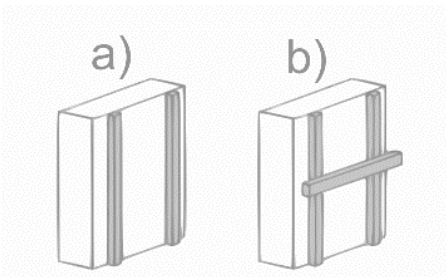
Substructure as a) vertical or b) cross-lathing
